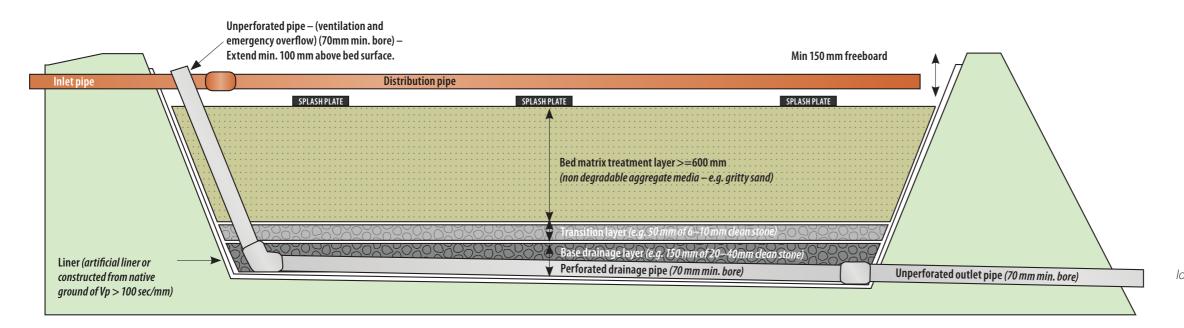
Typical plan view of a vertical flow constructed wetland prior to planting
